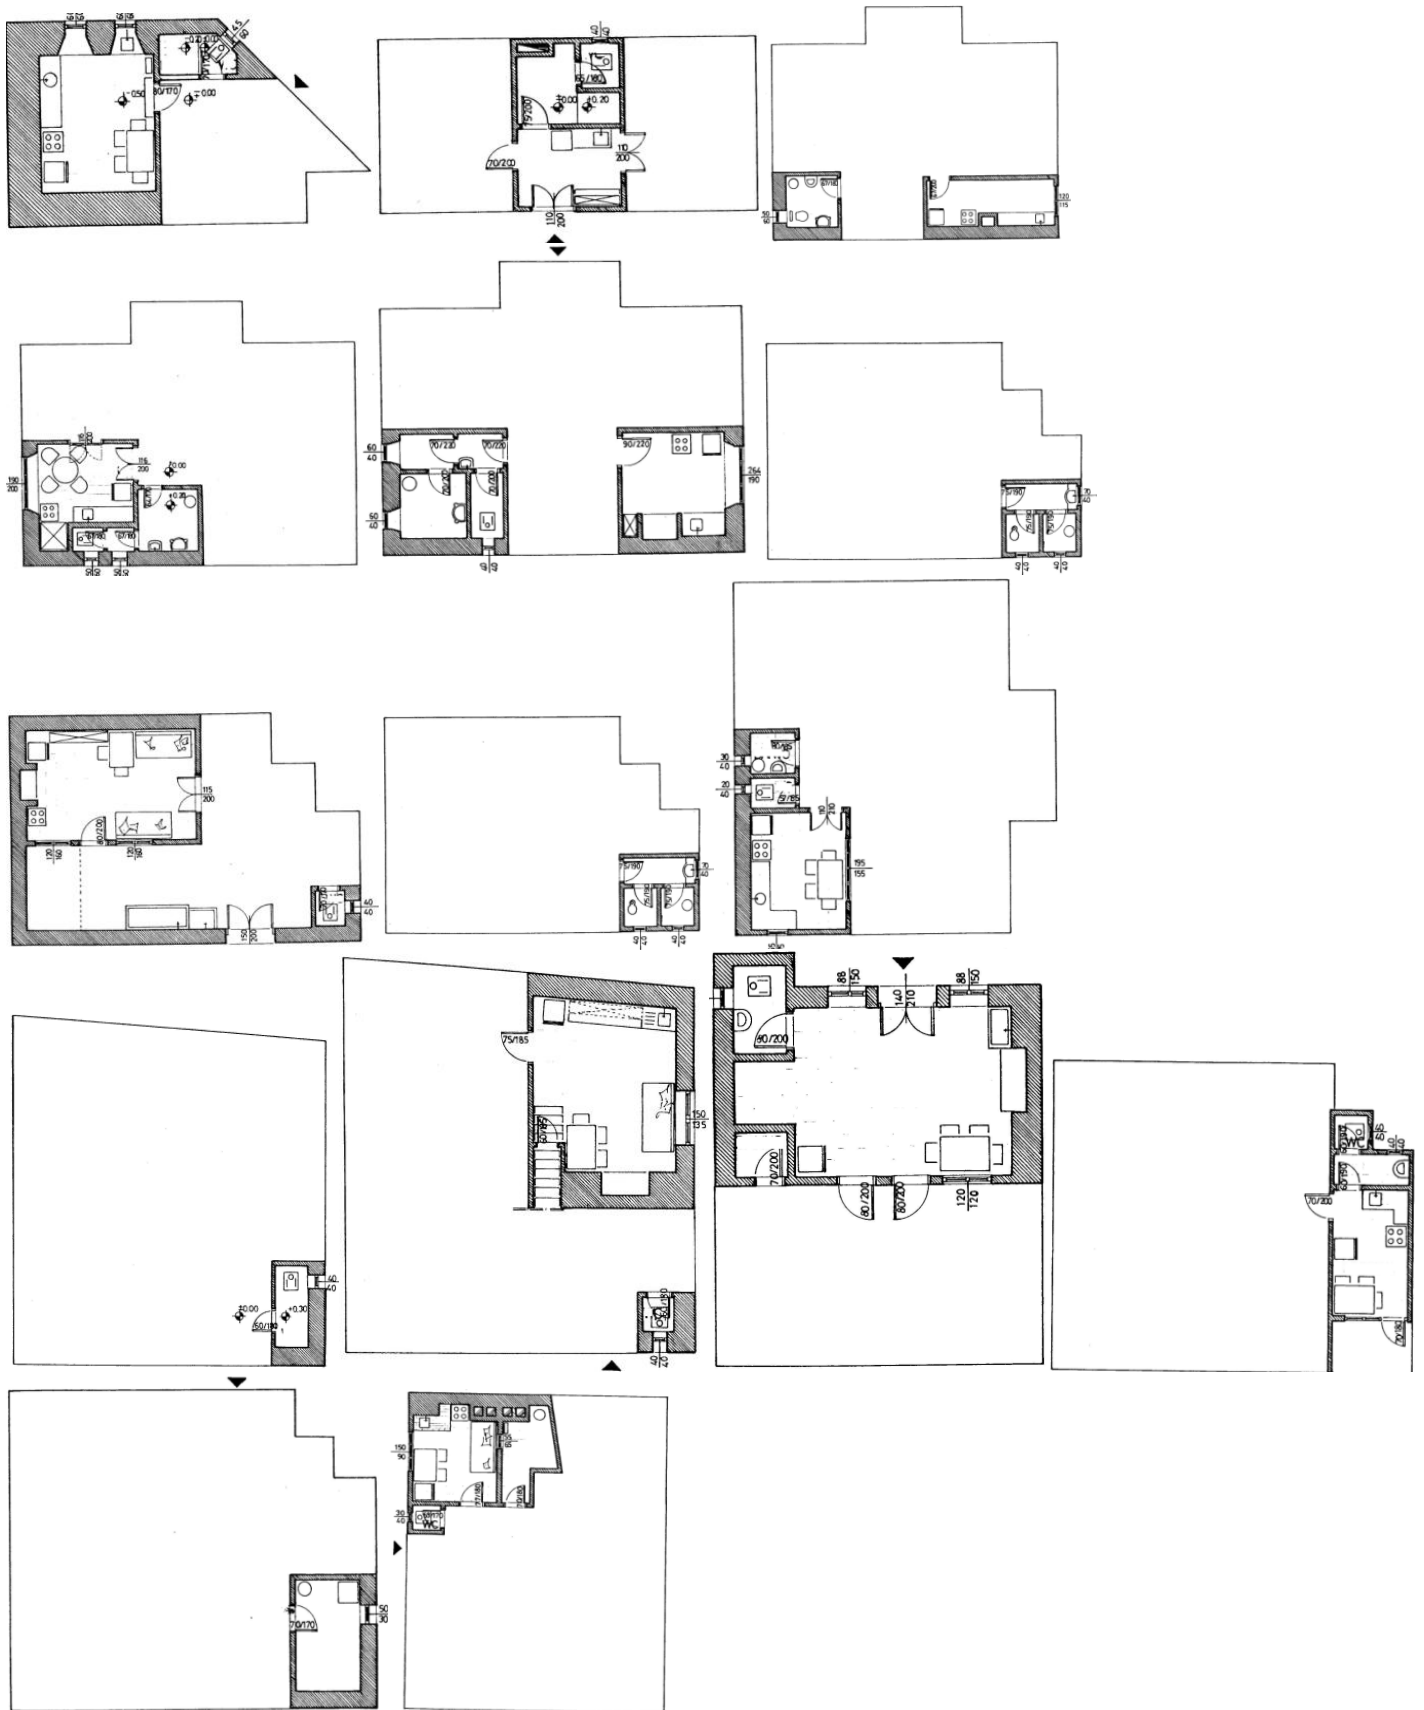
Plans of the building–sanitary equipment in the sample houses studied.
